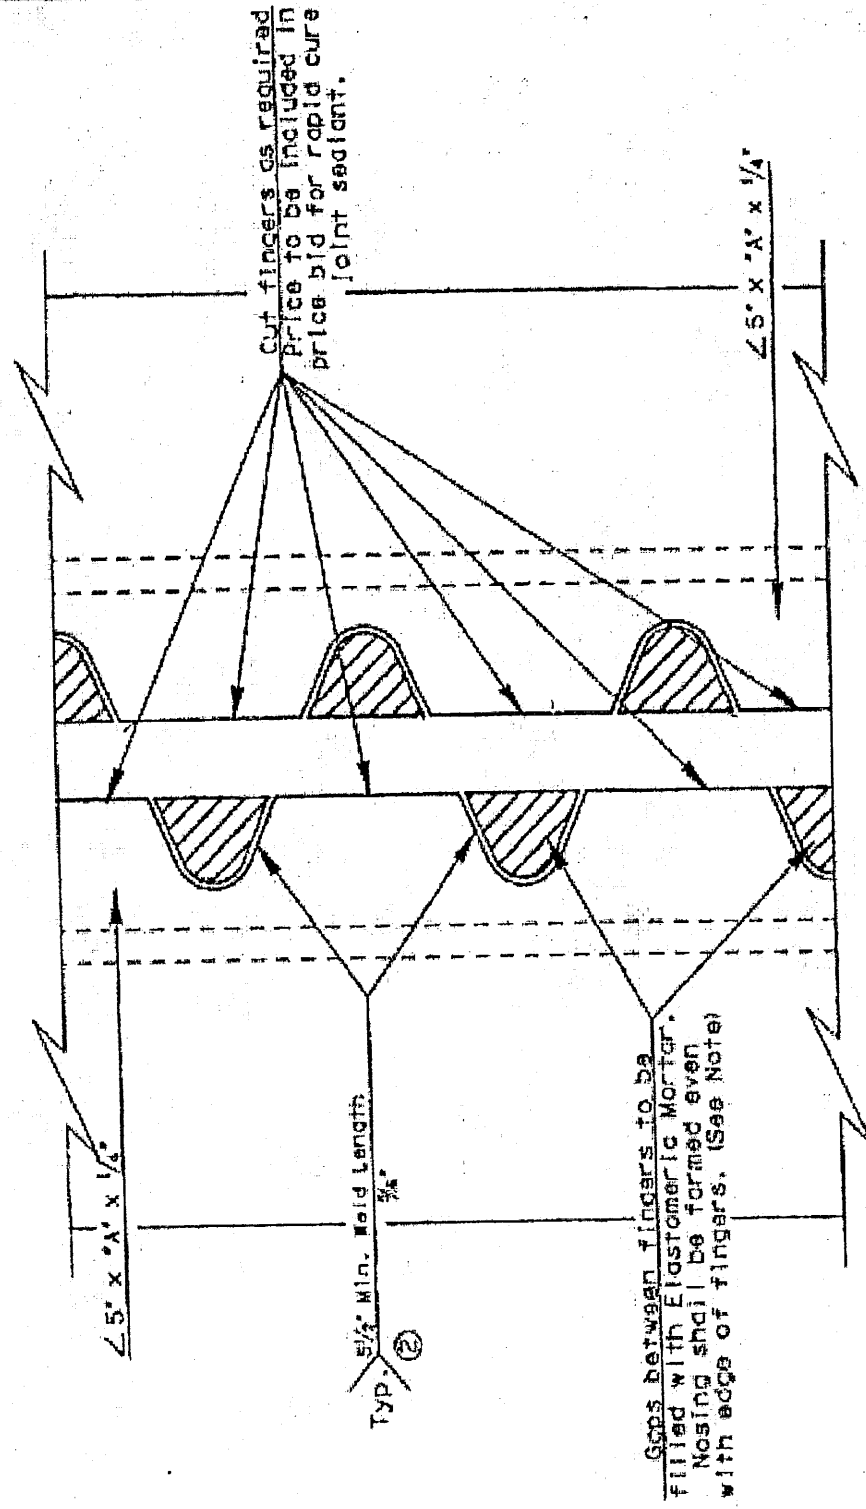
DETAIL OF EXPANSION JOINT WITH SLIDING PLATE IN PLACE
